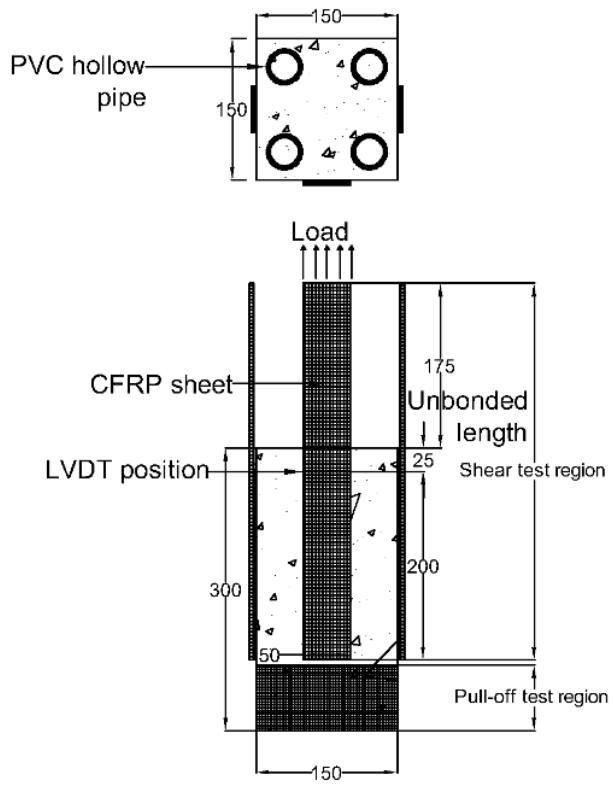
Details of bond specimen (unit: mm) for single lap shear test
